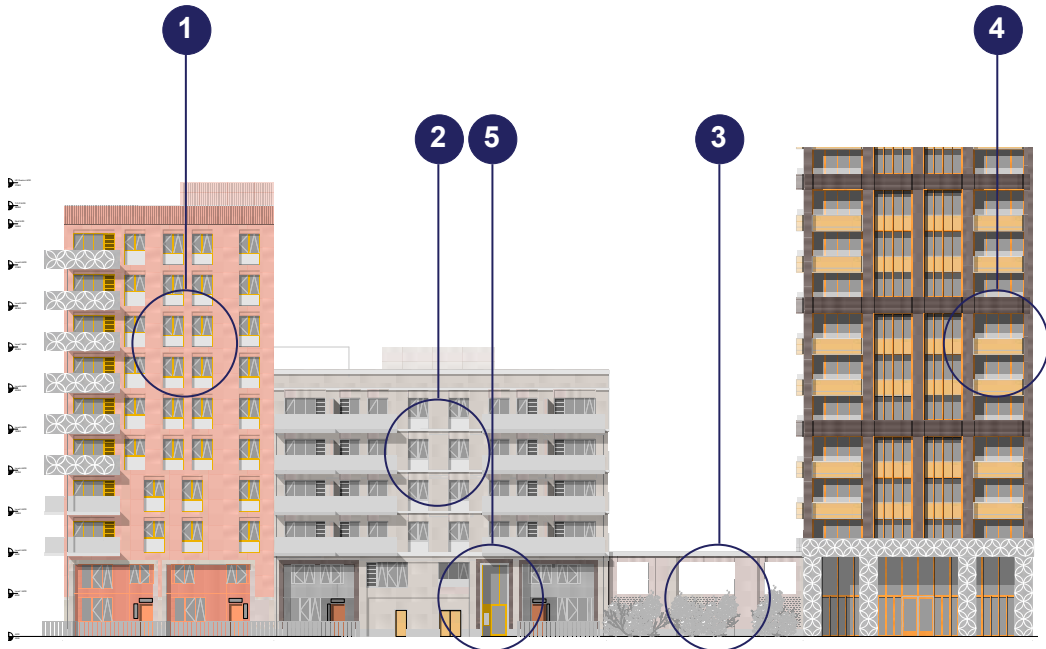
Block 4 South Elevation Revised Planning Submission February 2015
